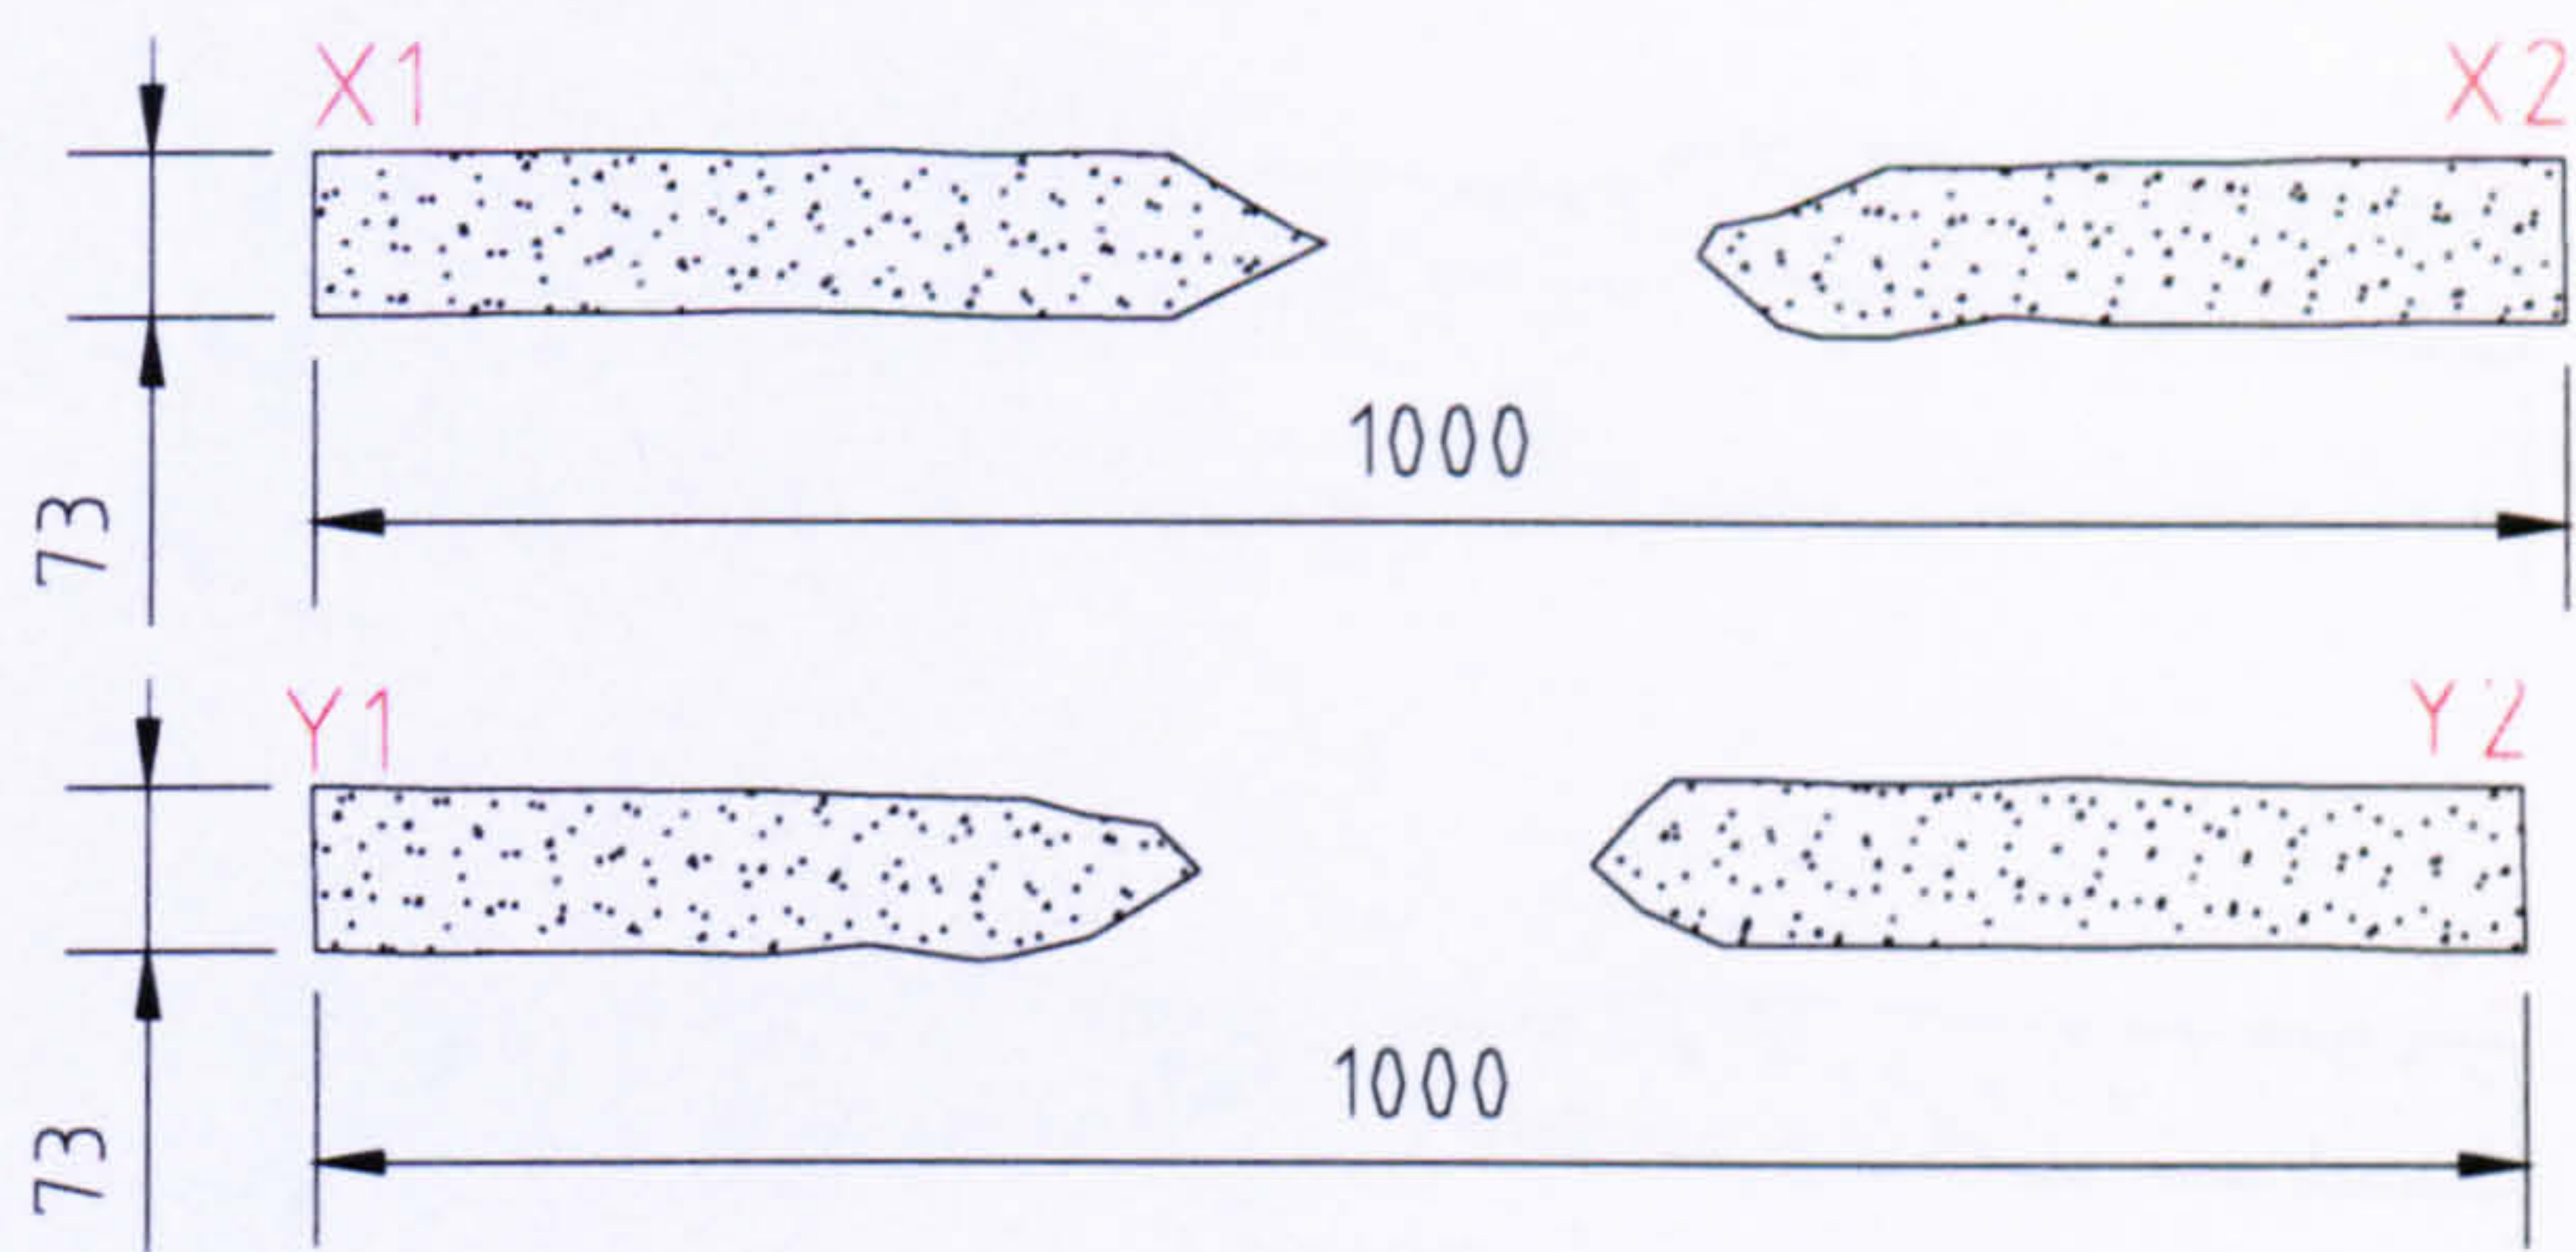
Cross-sectional elevation through X1-X2 and Y1-Y2 of secondary slab RCB73IT6
